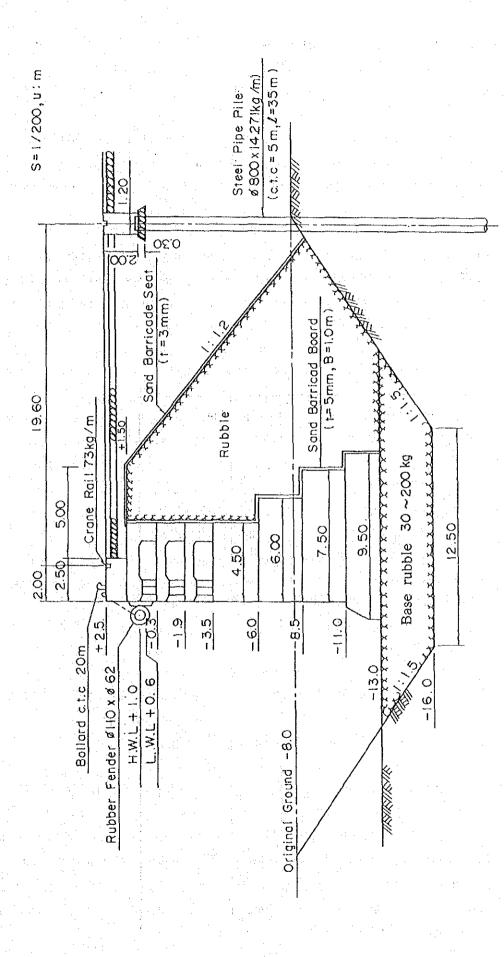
Typical Section of Concrete Block Type Quay
